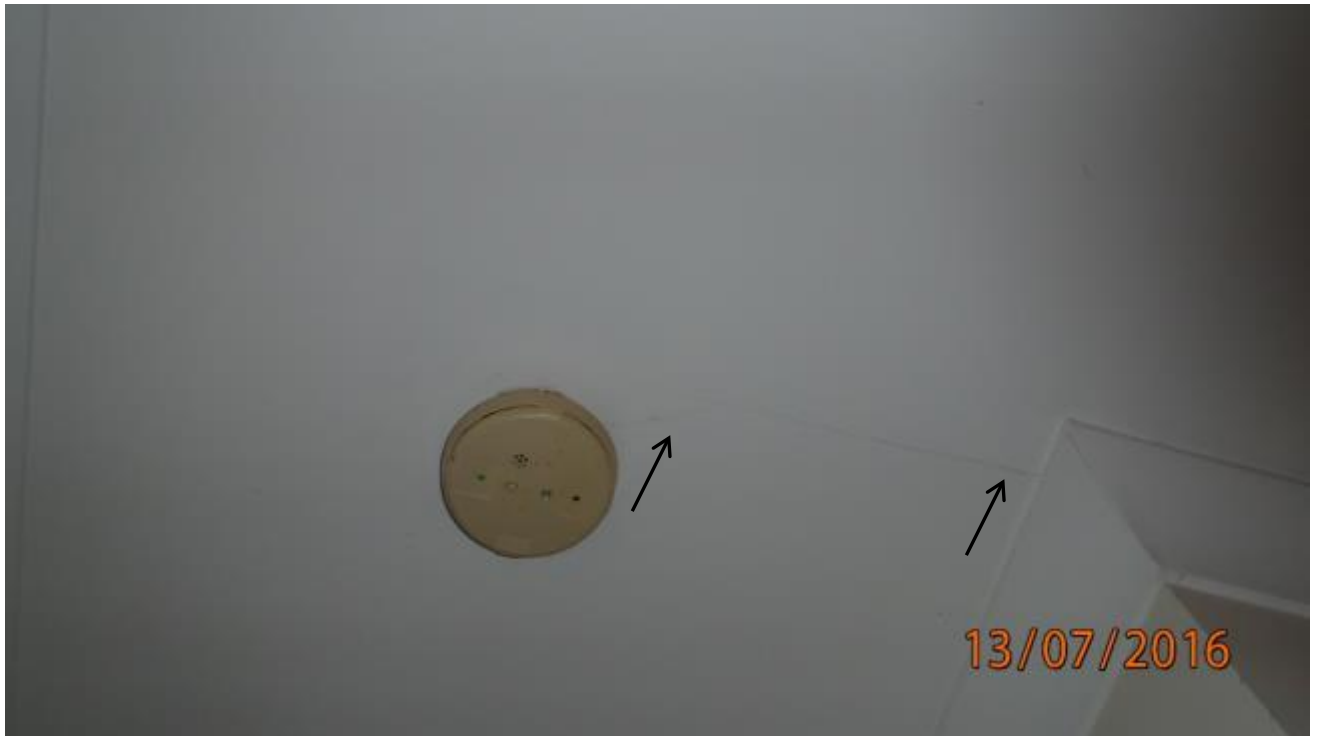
shows separation cracking to the wall cornice junction in Bedroom 2.
